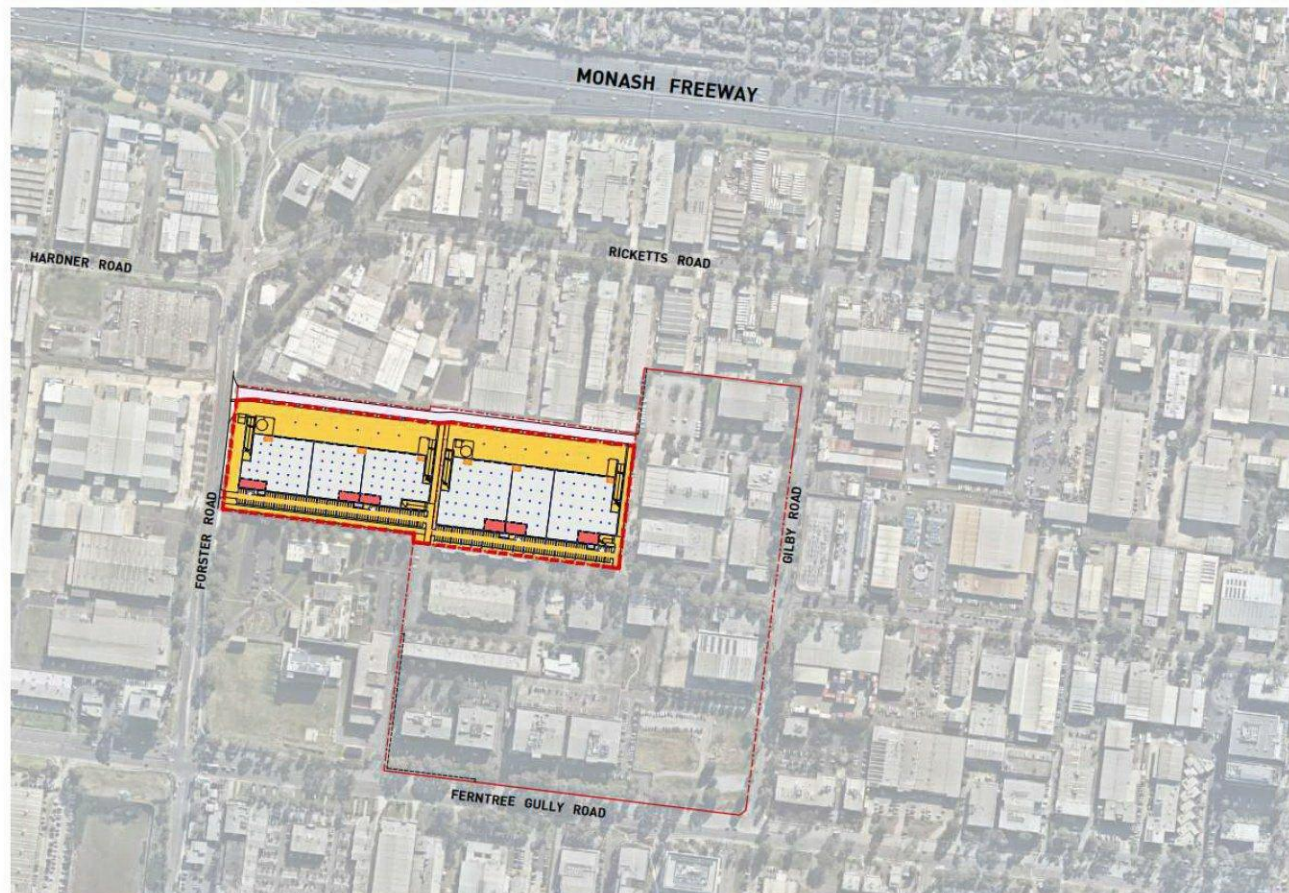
Site Plan (Planning Unit and ACP boundary in red)
